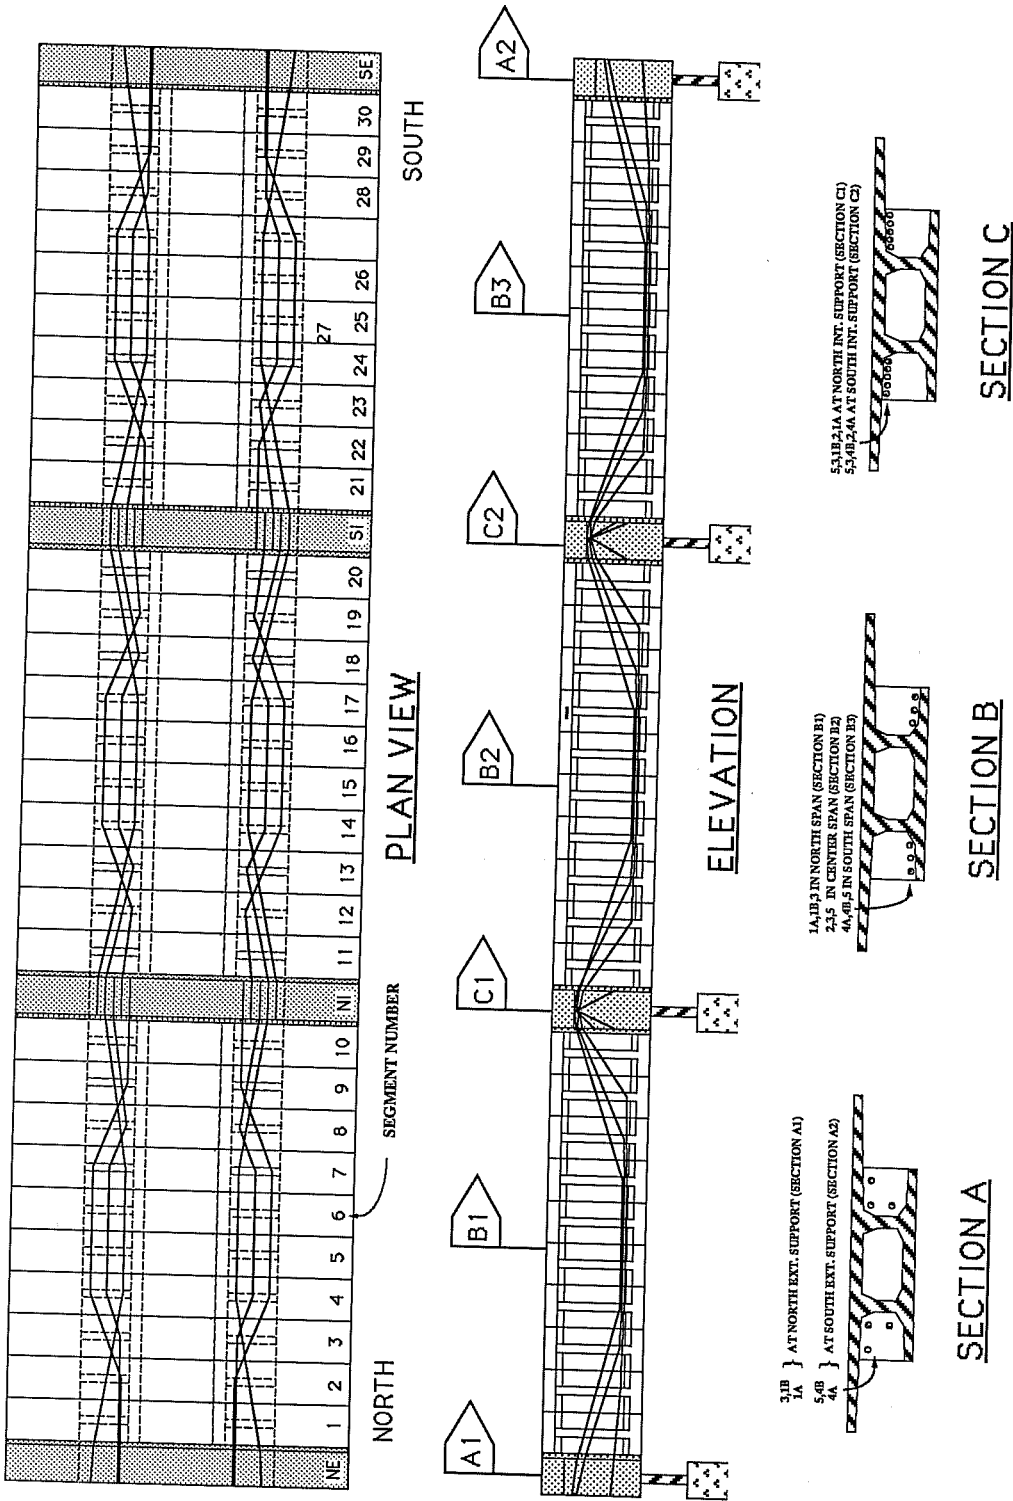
Schematic of Post-tensioning Layout in Bridge Model. (From Ref. 3)
